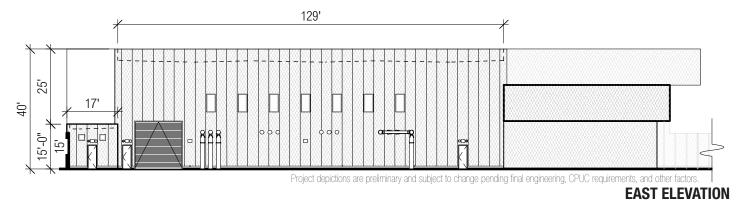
East elevation; steel structure, insulated metal panels, expanded metal mesh
